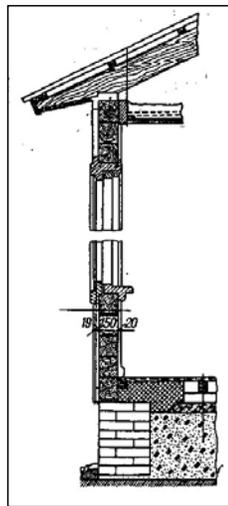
Section of horizontal log house wall construction in the Russian Federation (WHE Report 56)
